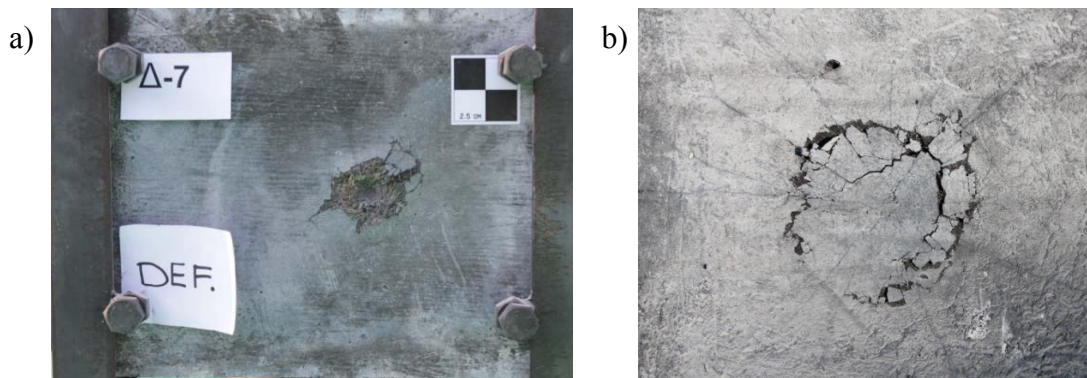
Damage on specimens made from UHPFRC containing 2 % of steel fibers: front face damage (a) and back face damage (b).
